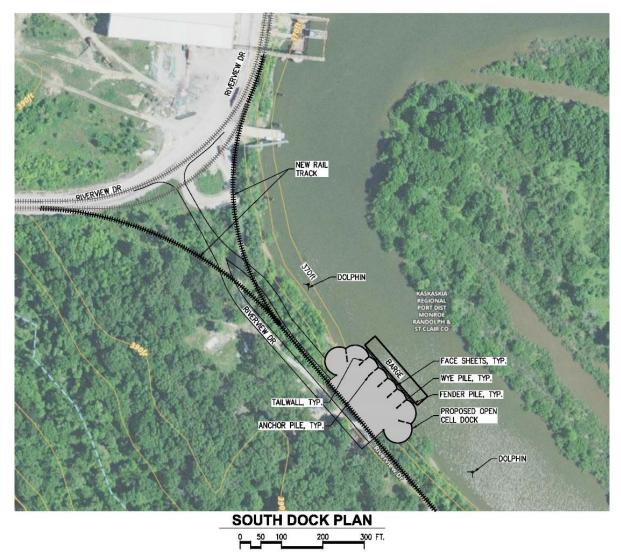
Plans for New South Dock with Rail Connections at KRPD#2 South Oxbow (KRPD image)
